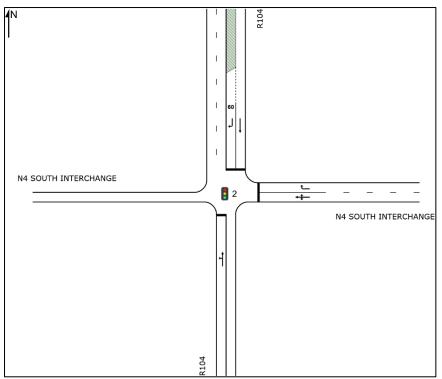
Intersection 2 Proposed Layout (Background Traffic)
